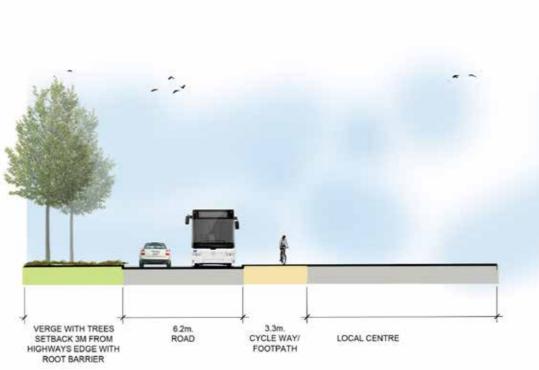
Section B - Through Northern Urban Centre (See Section 6.1 for Details on Bat Hop Over)
